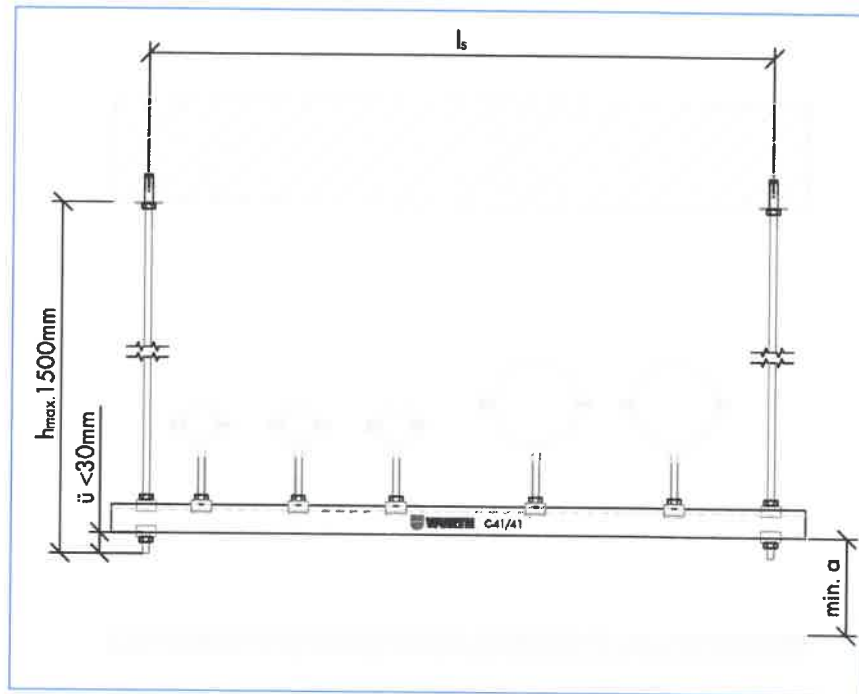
Example of a mounting rail in the ceiling plenum of suspended ceiling constructions in accordance with the Specimen Conduit Guideline ([German designation: MLAR]), edition of 10/02/2015, Section 3.5.3.
